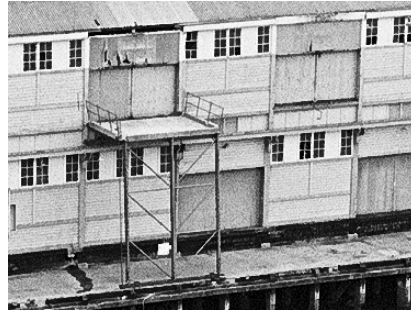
Detail photo of the west elevation of Pier 2/3, c1975, © Alan Croker
